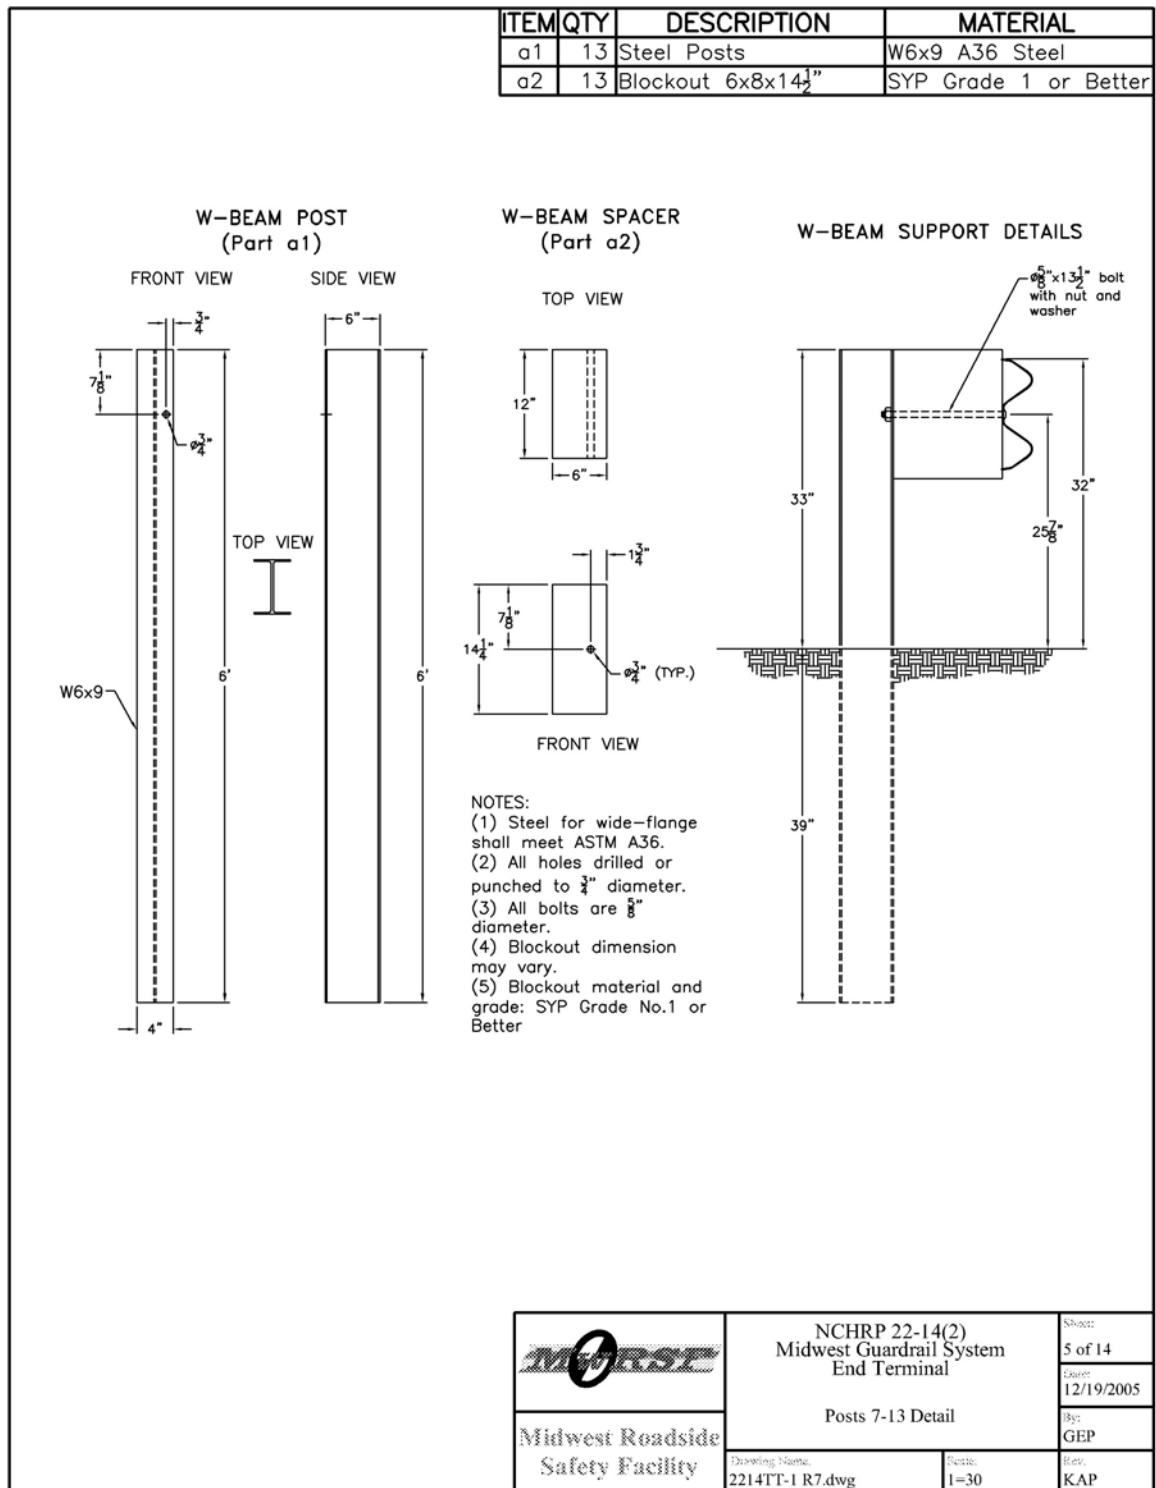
Midwest Guardrail System End Terminal - Post Details (English)
